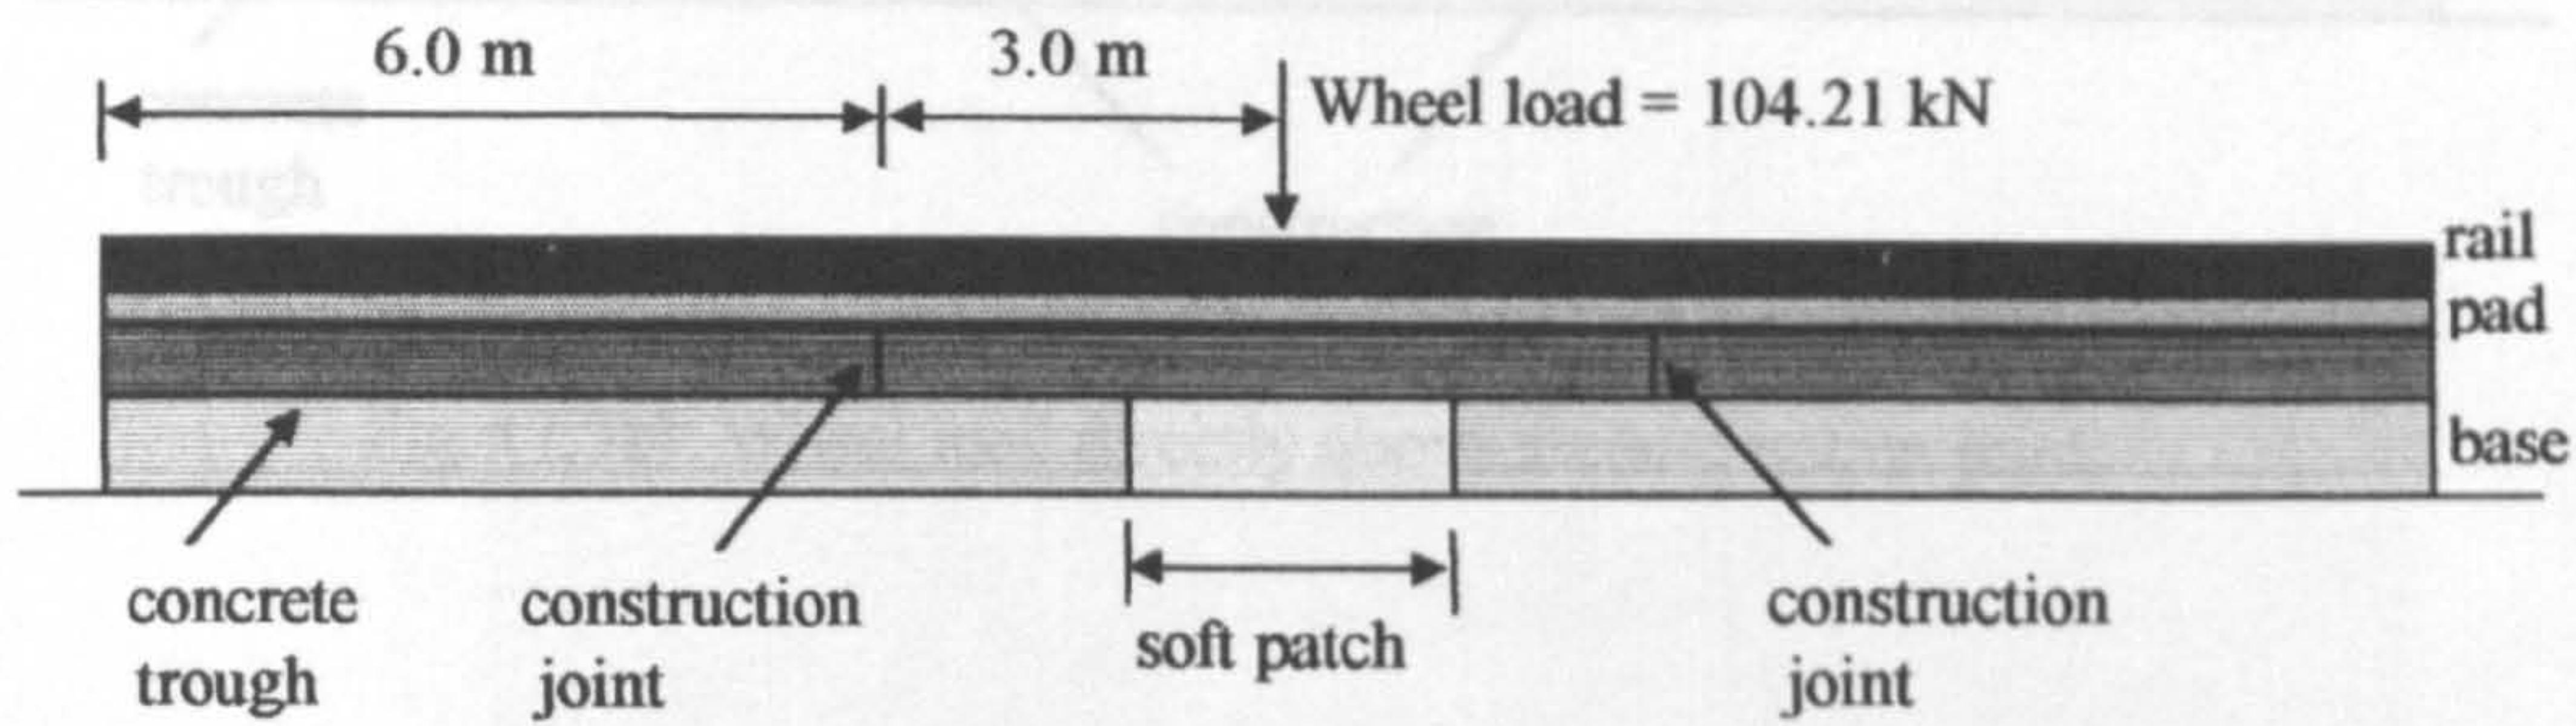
Wheel load at distance 3 m from a construction joint.
